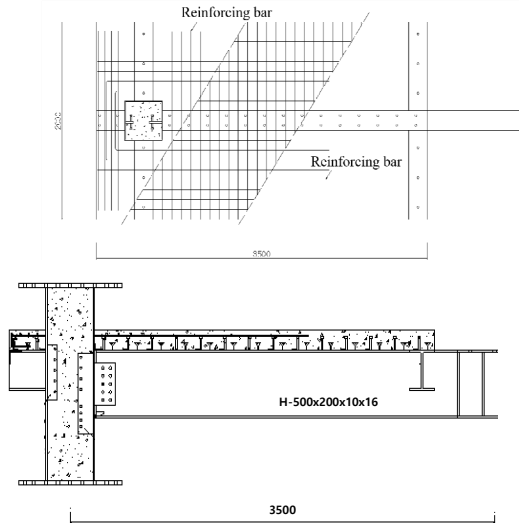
Experiment with lower flange attachment<sup>[4]</sup>
